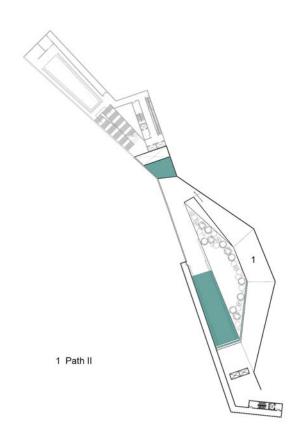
3rd Floor Plan, Tunnel's Upper Level
